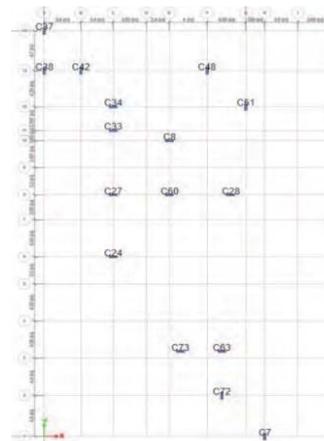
Plan of an existing structure showing the failed columns which are overstressed
